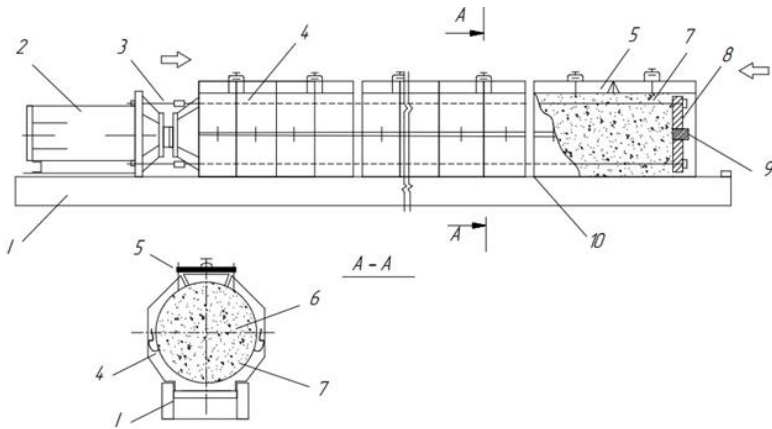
Compression scheme of a full-scale pier post in formwork using the “on-mixture” method
